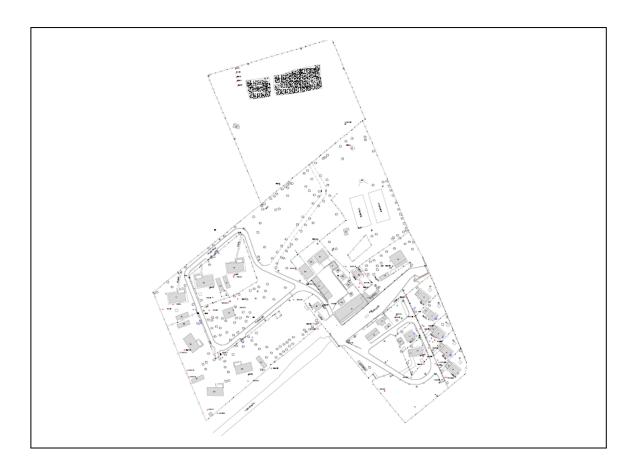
Van Rooyenshek Port of Entry: Site Layout
